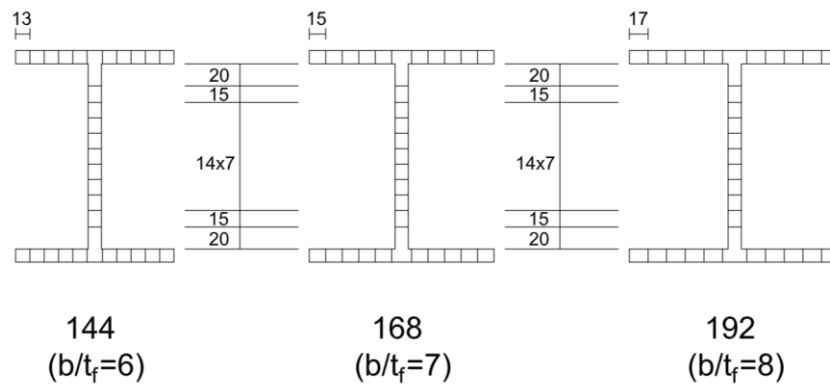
Dimensions of Strips used in the Modified Sectioning Method (all dimensions are in mm)
